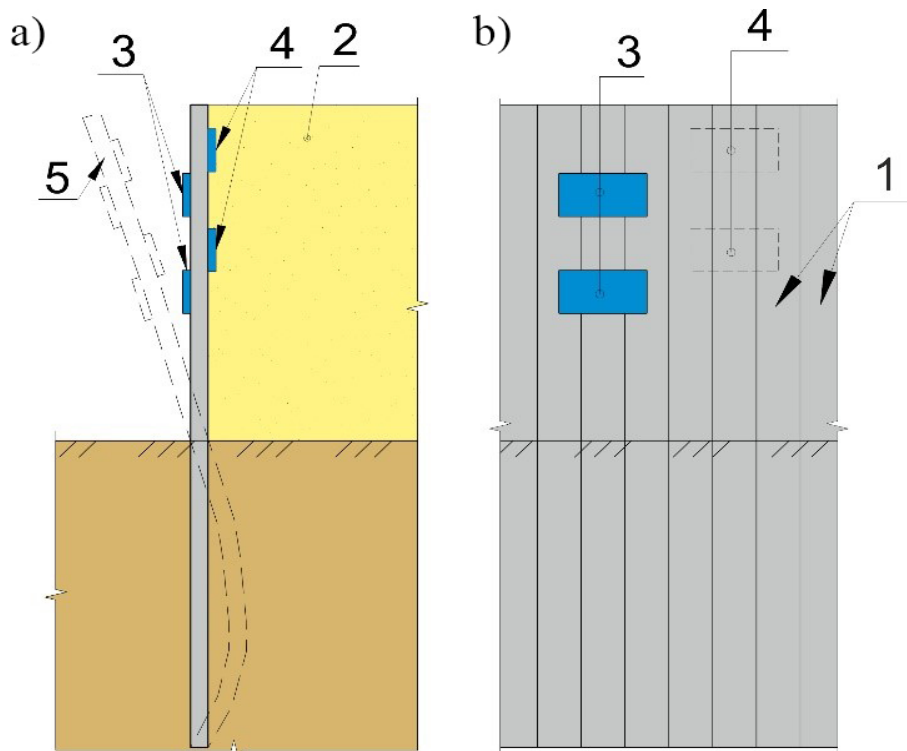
Application of the rigid strips for the bulkhead: (a) cross-section; (b) and fragment of the sheet pile wall face.
